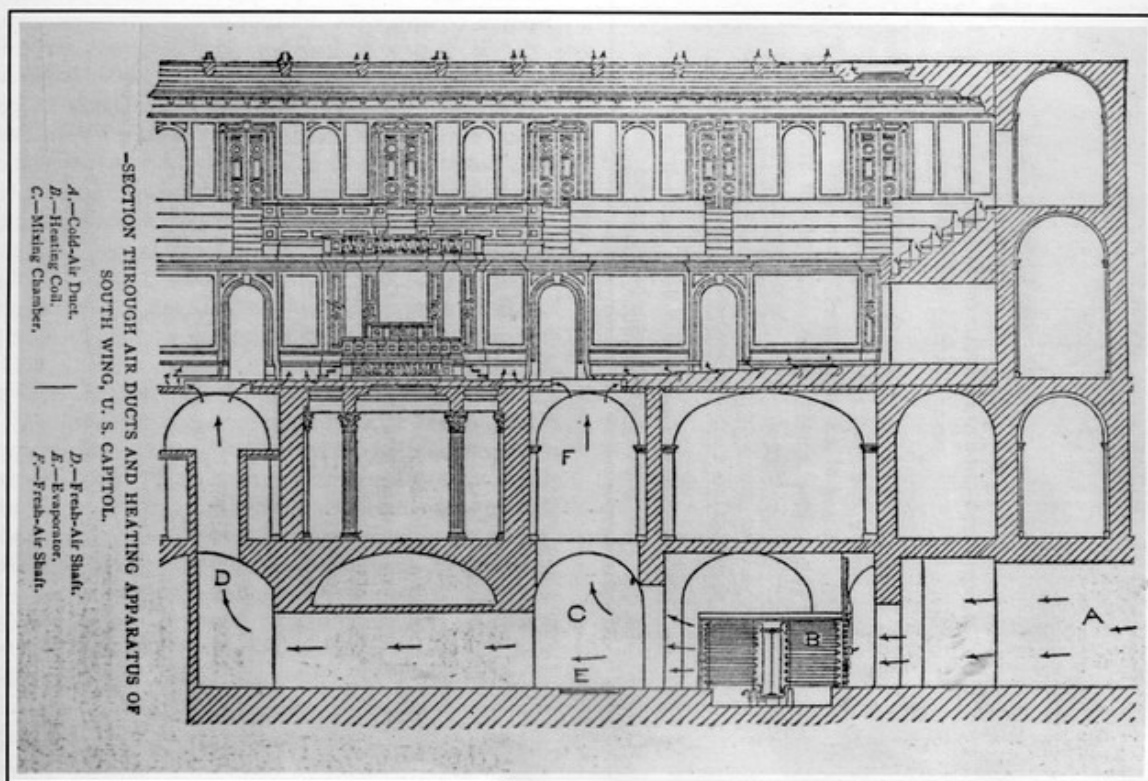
Section through air ducts and heating apparatus of south wing, U.S. Capitol (from J.S. Billings, 1886, p. 126).
